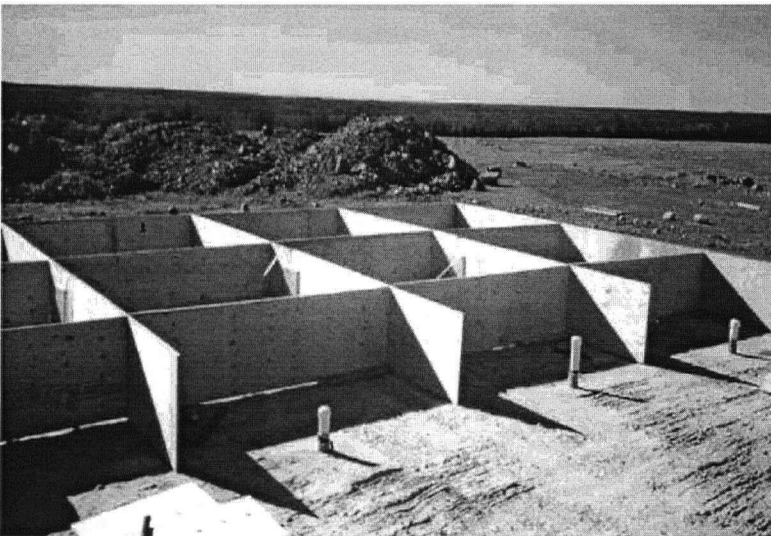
Photograph of lysimeter dividers prior to installation of sloped cement.
